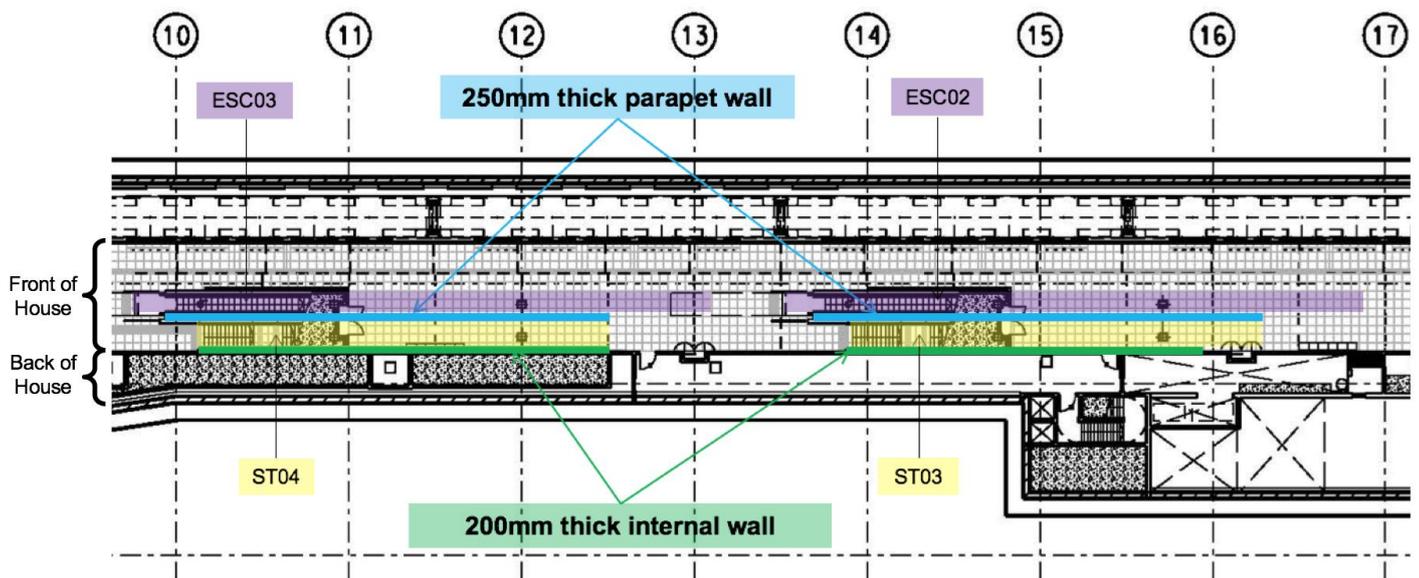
Layout plan of the Internal Wall and Parapet Wall (lower platform level)
